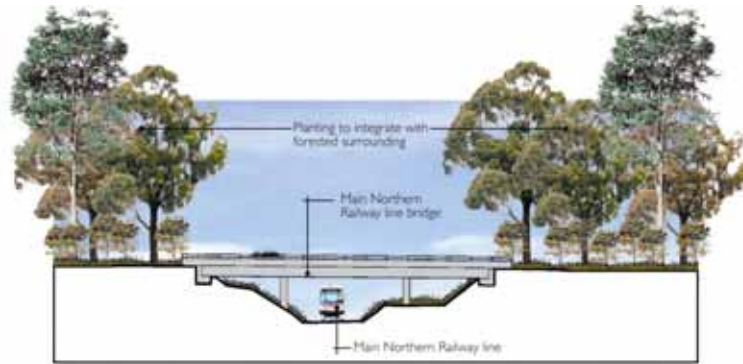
Bridge over the Main Northern Railway line – looking westwards
